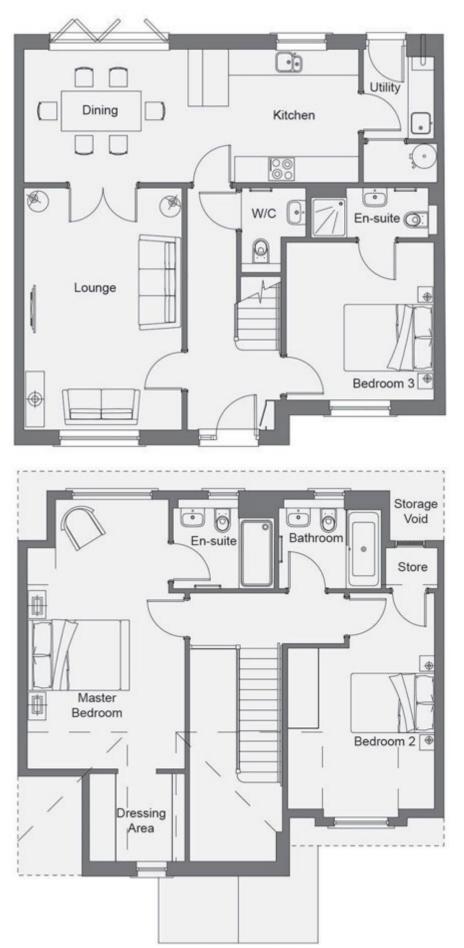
Rowan House-type Floor Plans. Dandara Homes Website
